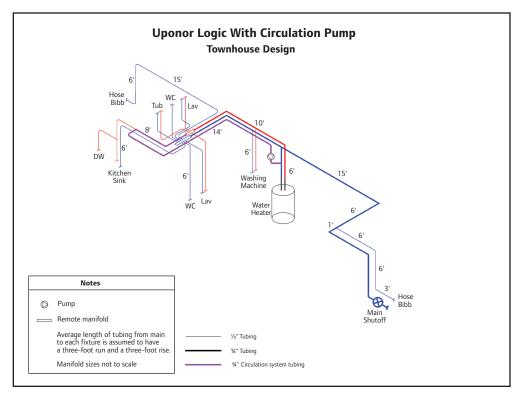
Uponor Logic for a Typical Townhouse Plan
